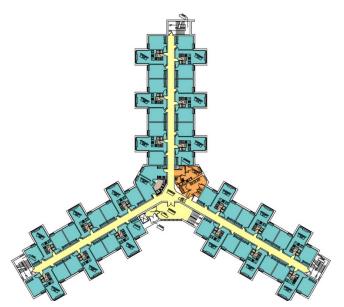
Grasso Hall Typical Residential Level Floor Plan
